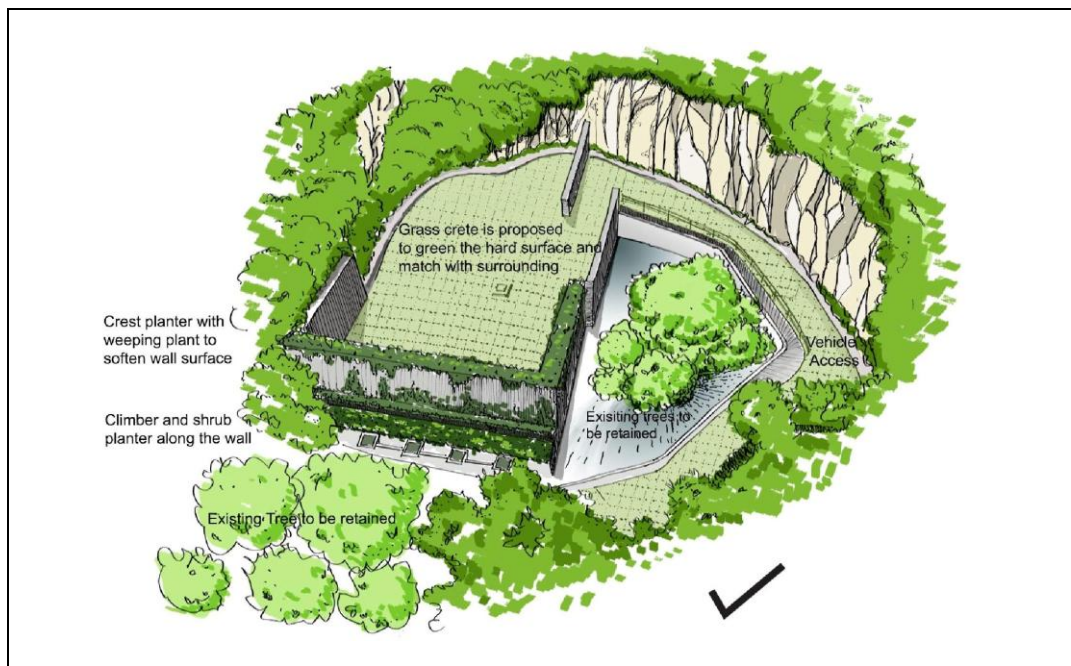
Reinforced Concrete Barrier Wall with Landscape Treatment
